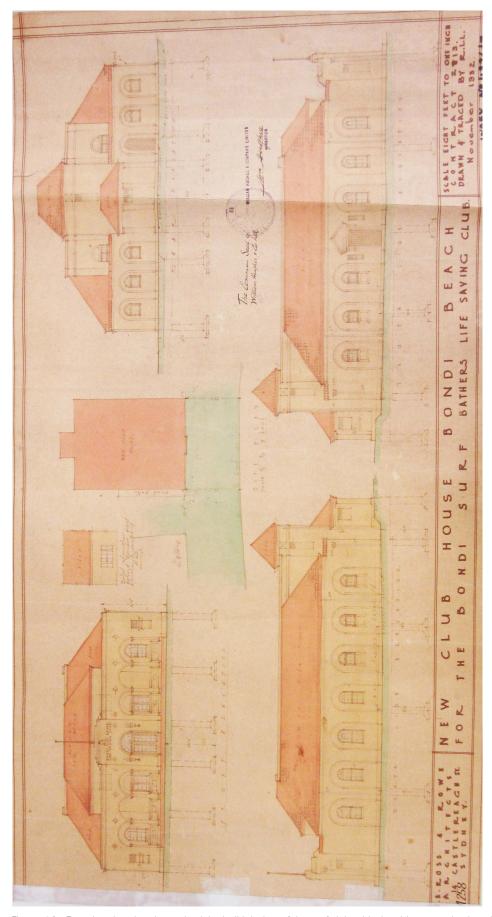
Drawing showing the revised (as built)design of the surf club with the side rooms having pitched roofs The front elevation is similar but the walls of the sunbaking terrace are hidden by the added roofs and semi-circular headed windows and recesses have been added to the side elevations. Source: Jean Rice Architect, photographed at WLS.
